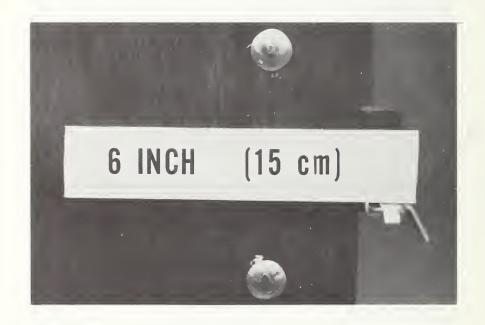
Note the positions of the bolts in the corner post of crib No. 3. If the bolt holes had been placed closer to the vertical axis of the corner post, the structure would have had greater load bearing strength.
